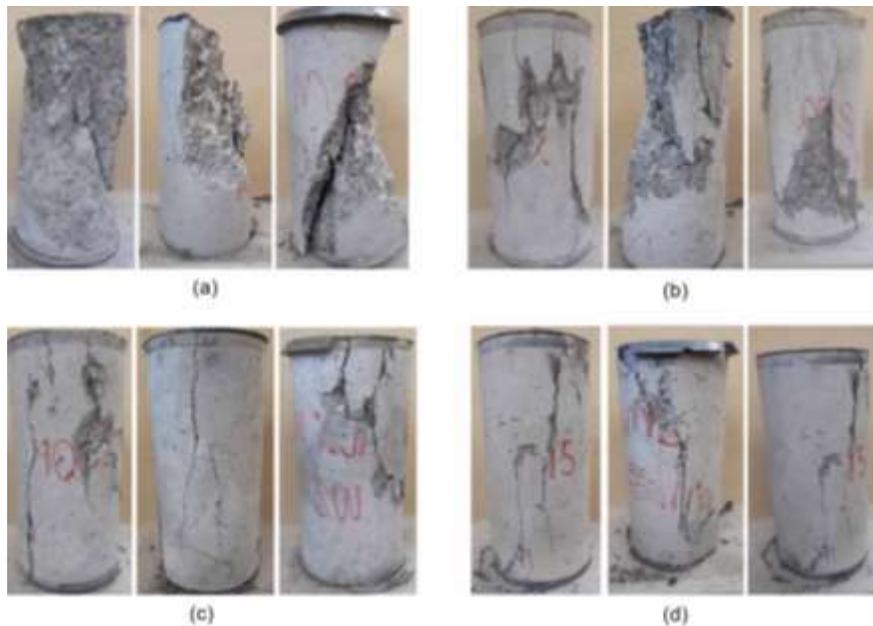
Concrete specimens after failure: (a) TDA-0; (b) TDA-5; (c) TDA-10; (d) TDA-15.
